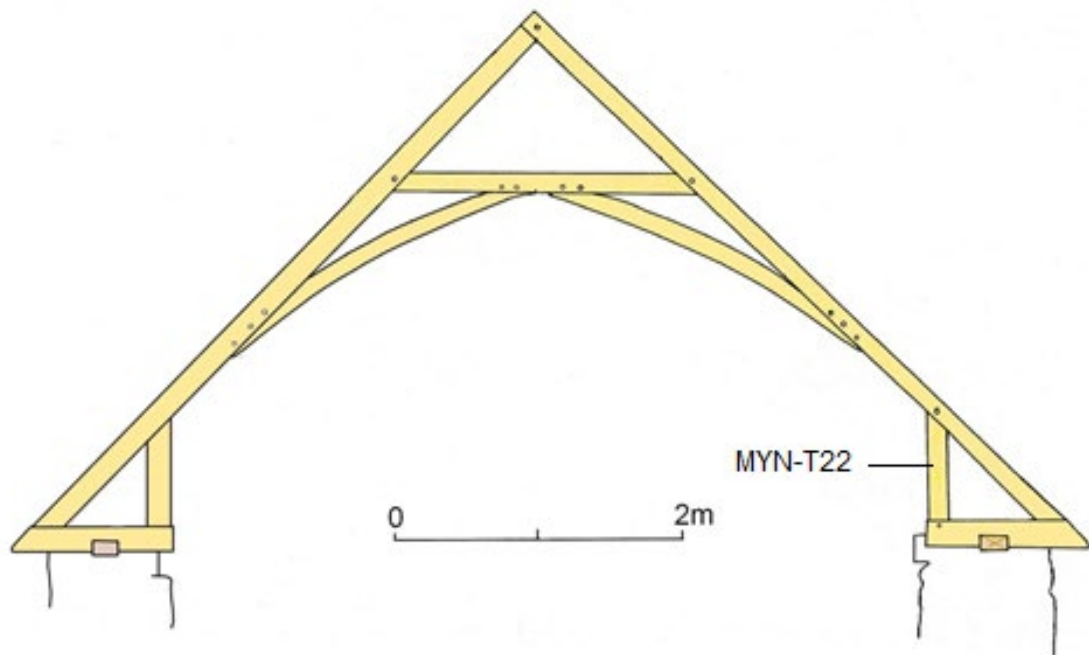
Nave roof, frame 15, showing sampled timber MYN-T22 (Bob Meeson)
